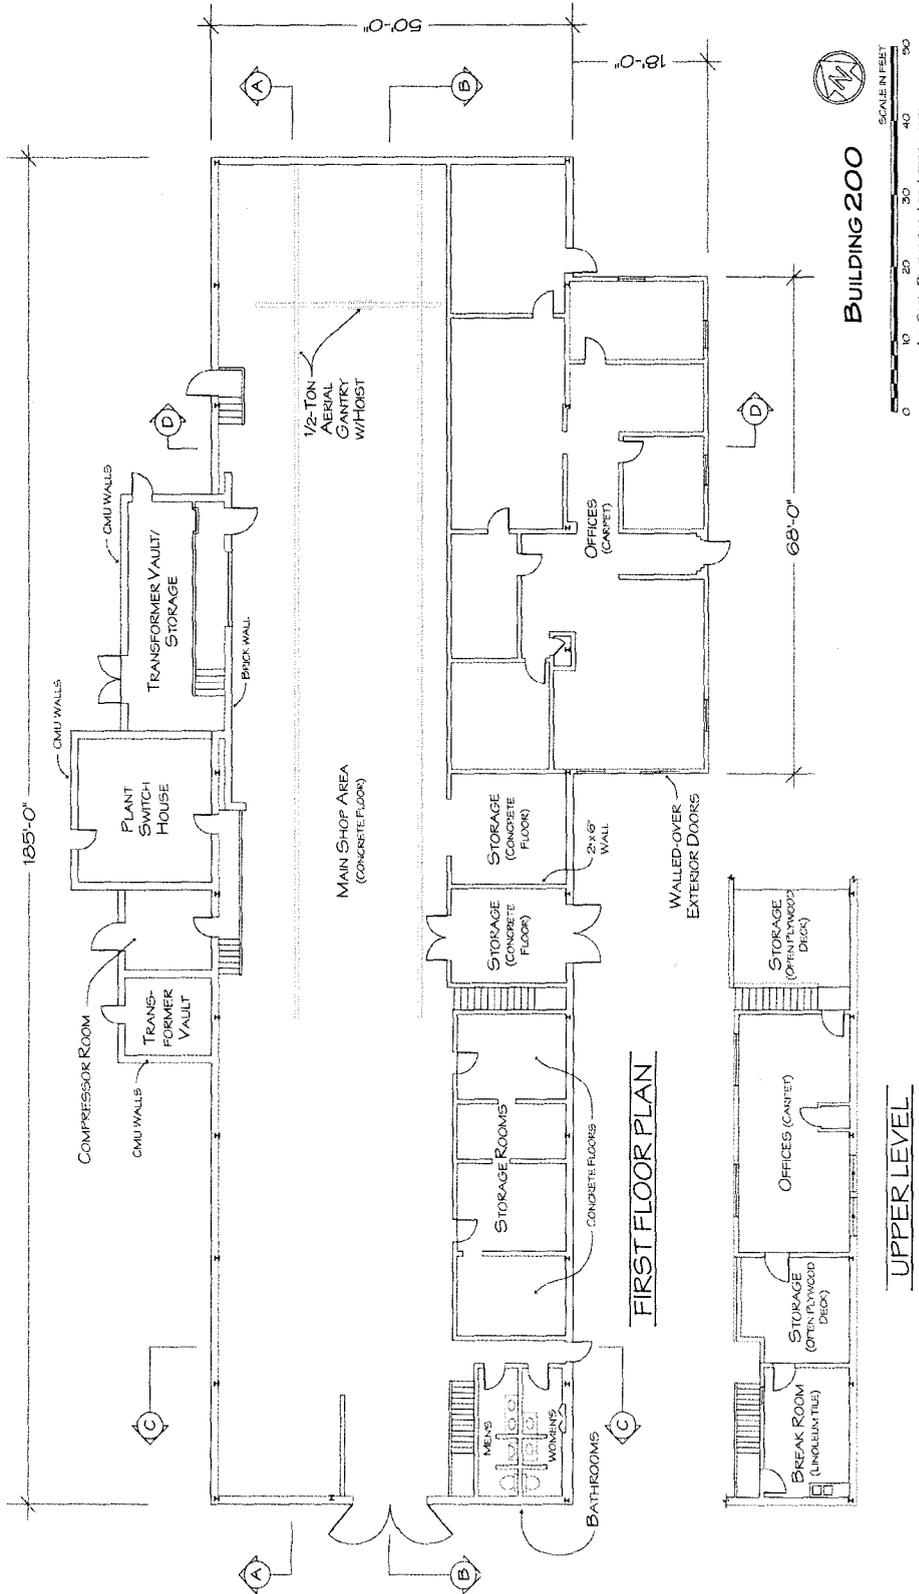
Floor plan, Building 200 (drawn by Simon Herbert, Statistical Research, August 2005).
